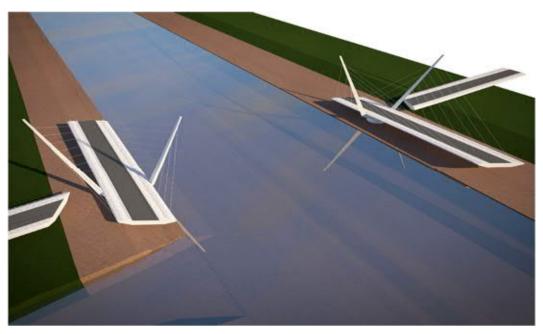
Twin Leaf Swing Bridge Options (bridge closed to road traffic)
